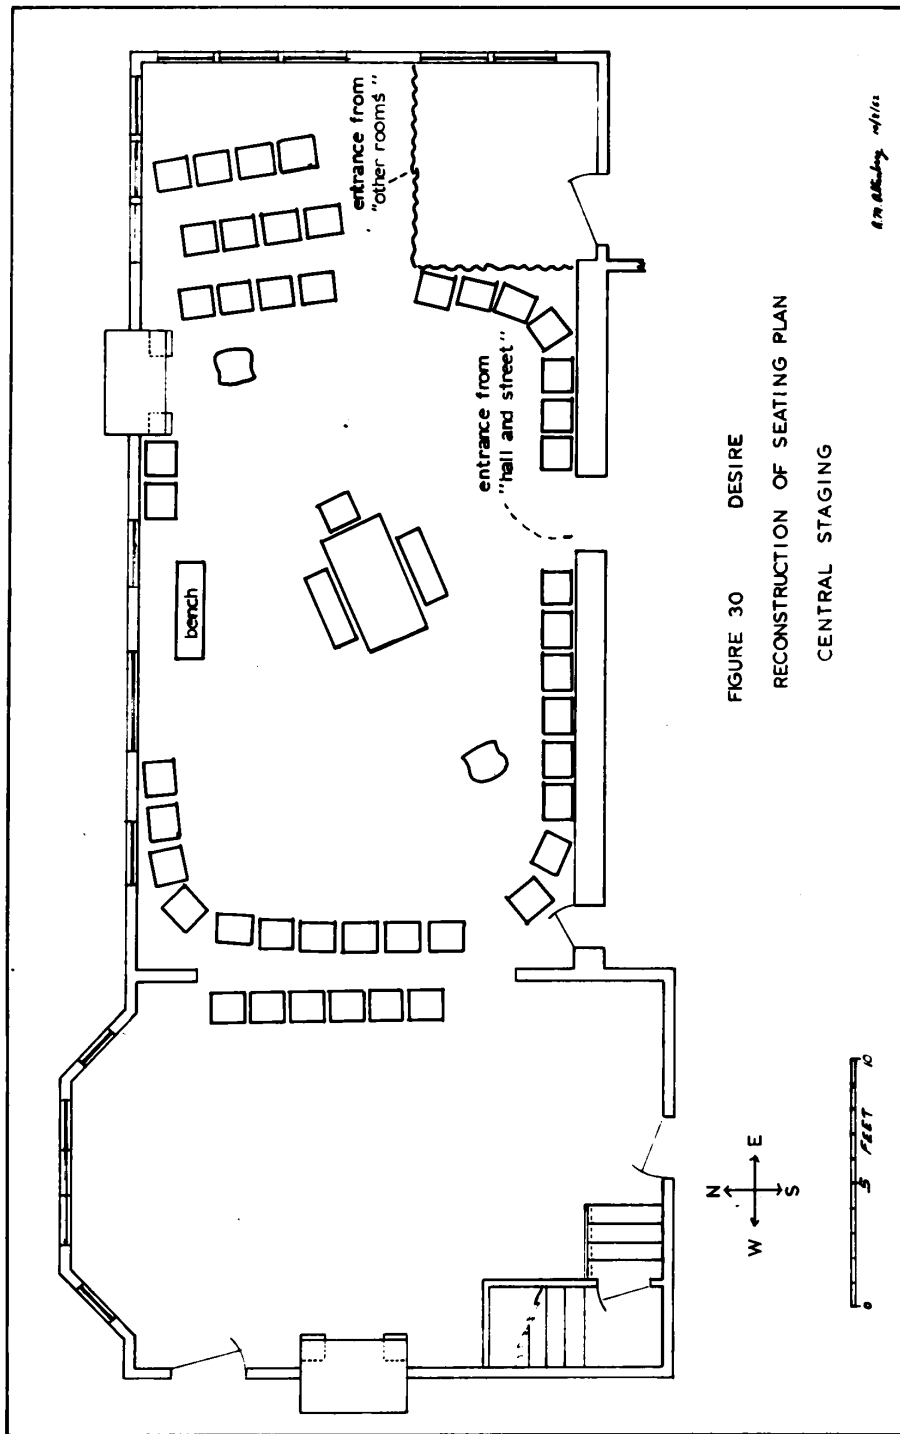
Reconstruction of floor plan of seating and set, "Desire".
